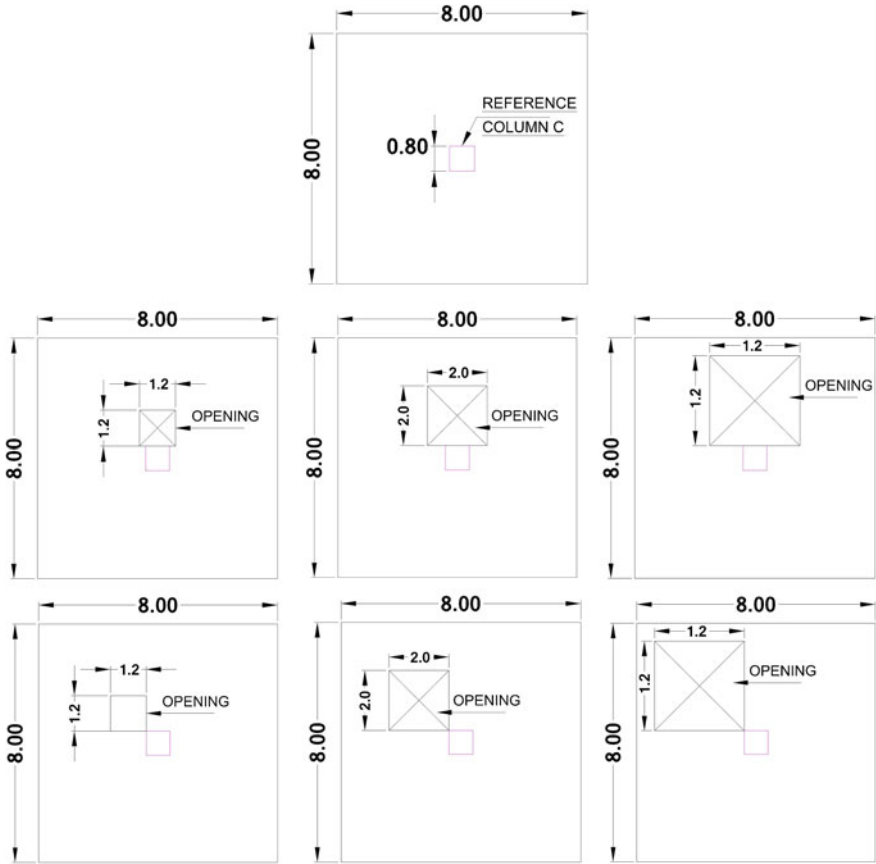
Opening layout scheme of models. (Dimensions in m)
